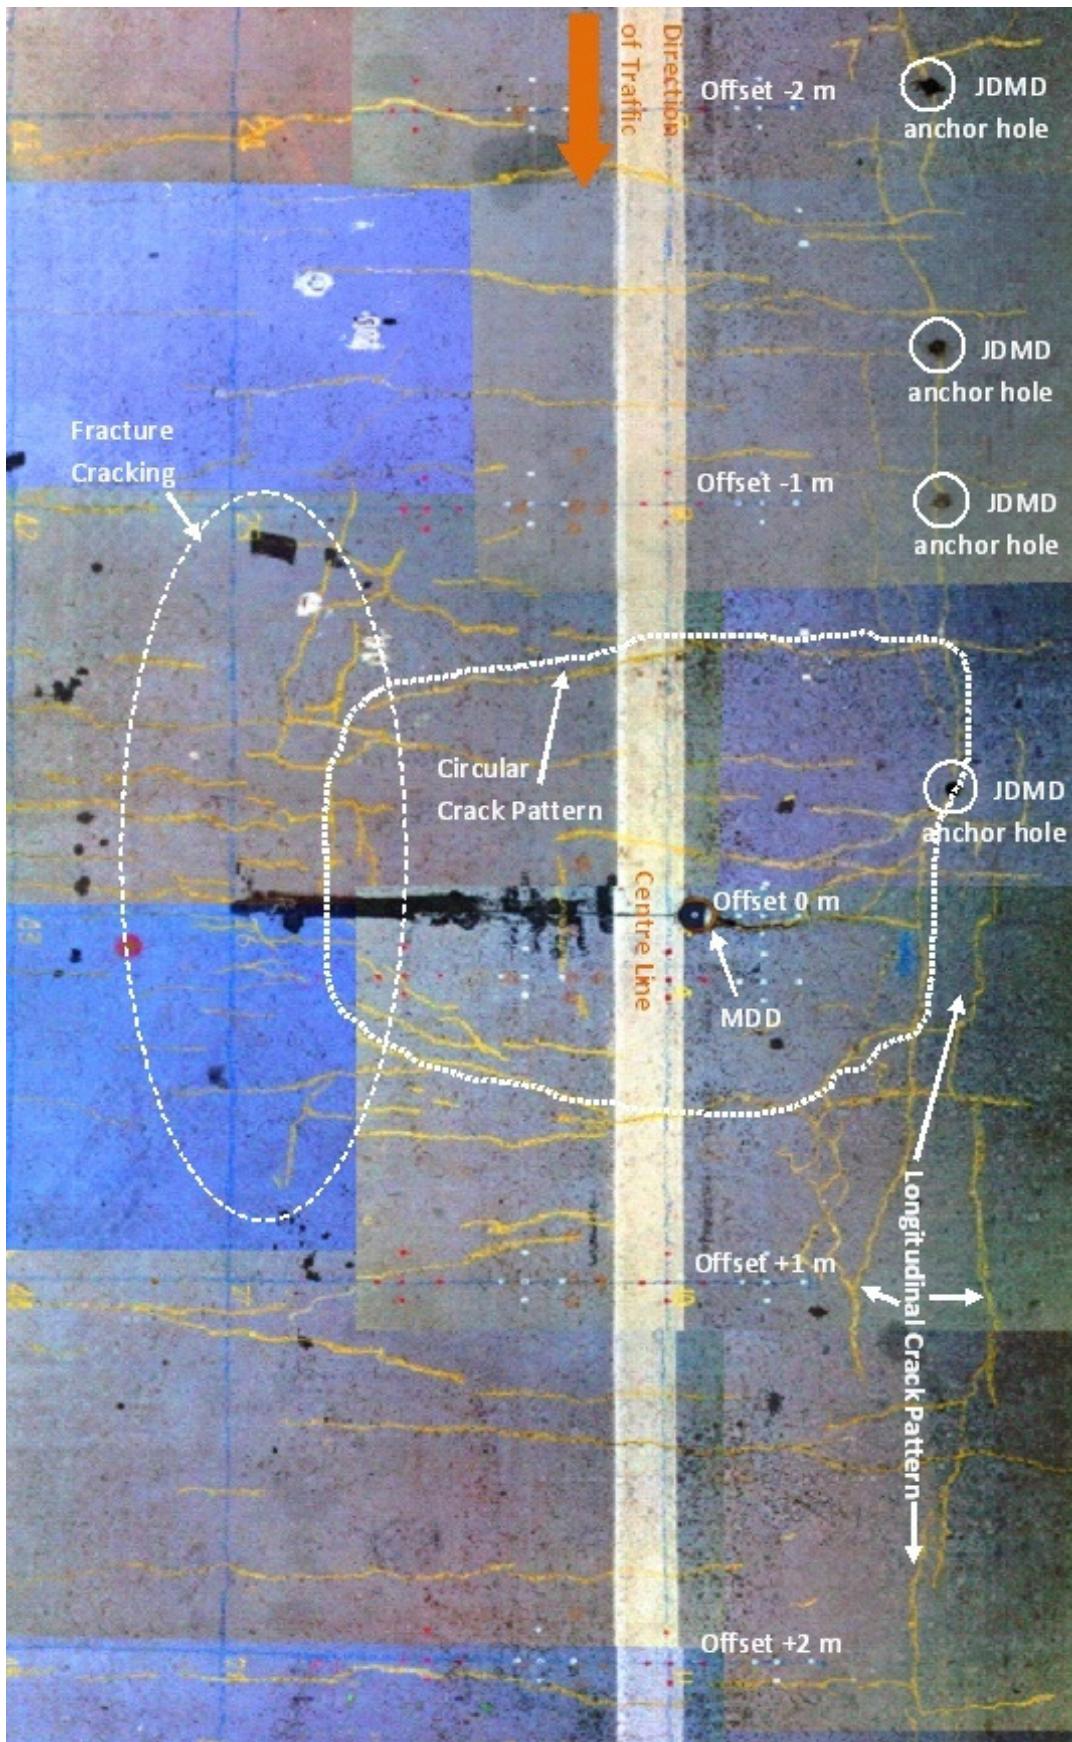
Pictorial view of cracks on test section at longitudinal offsets -2 m to +2 m at 2.8 million load applications
